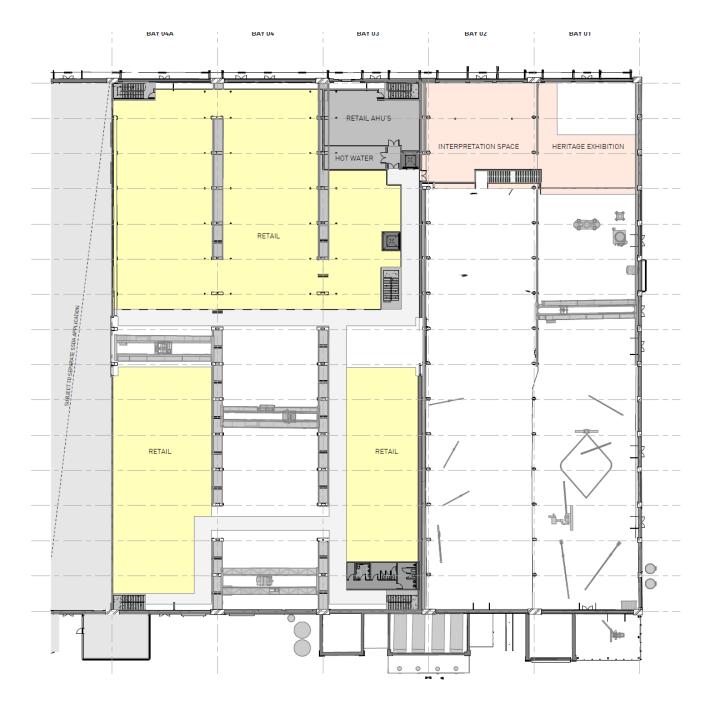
Proposed Level 1/ Mezzanine Level plan for Bays 1-4a – EIS submission Source: Sissons
